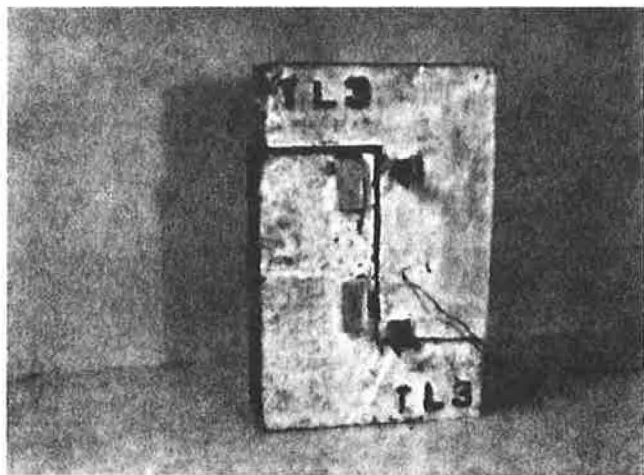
Typical failure of TN, TL, PN, and PL specimens (slippage along the shear plane).
